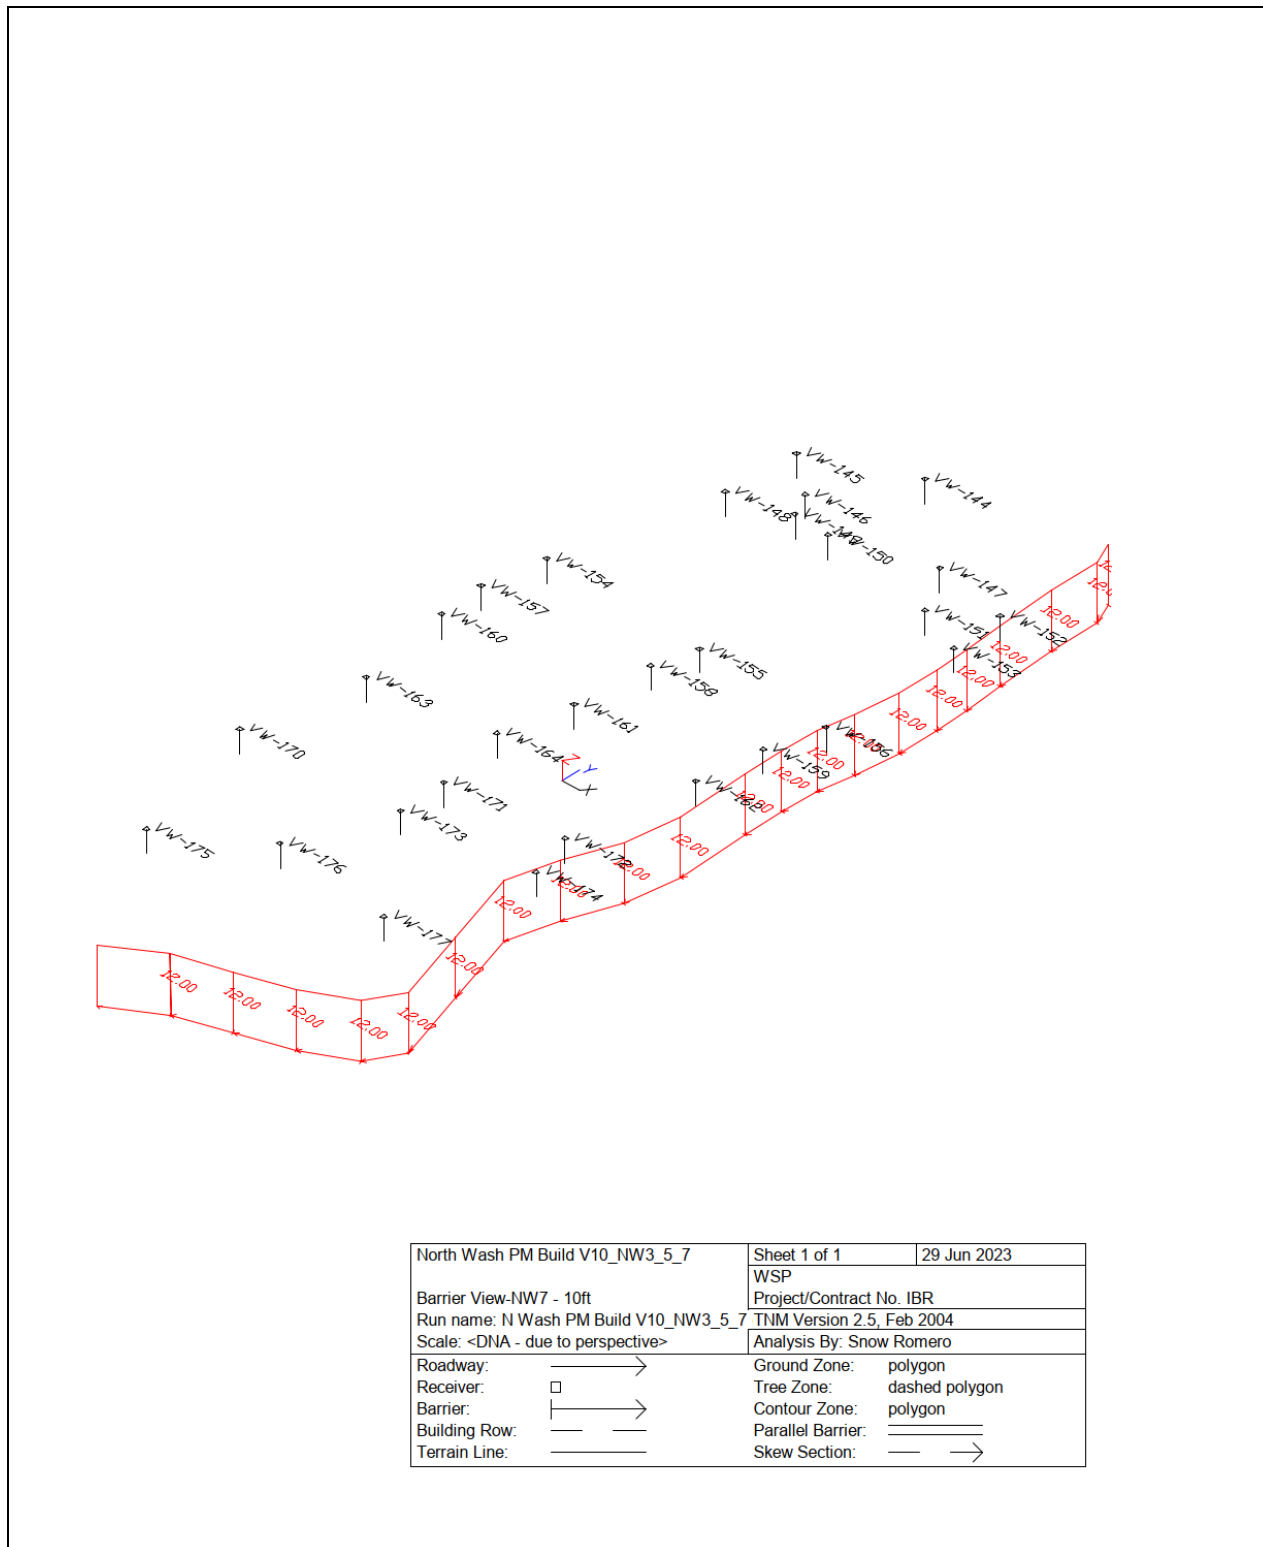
TNM Noise Wall Graphic – Noise Wall 7 (labeled as Noise Wall 8 in TNM)
